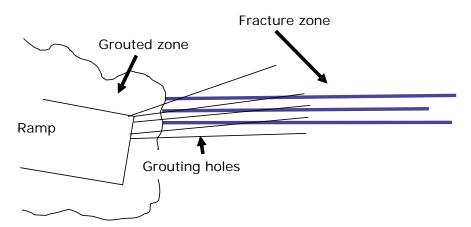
Example of principles for the grouting of sub-horizontal near-surface zones intersected by the ramp. The length and orientation of grout holes will be chosen with respect to the orientation between the ramp and the zone.
